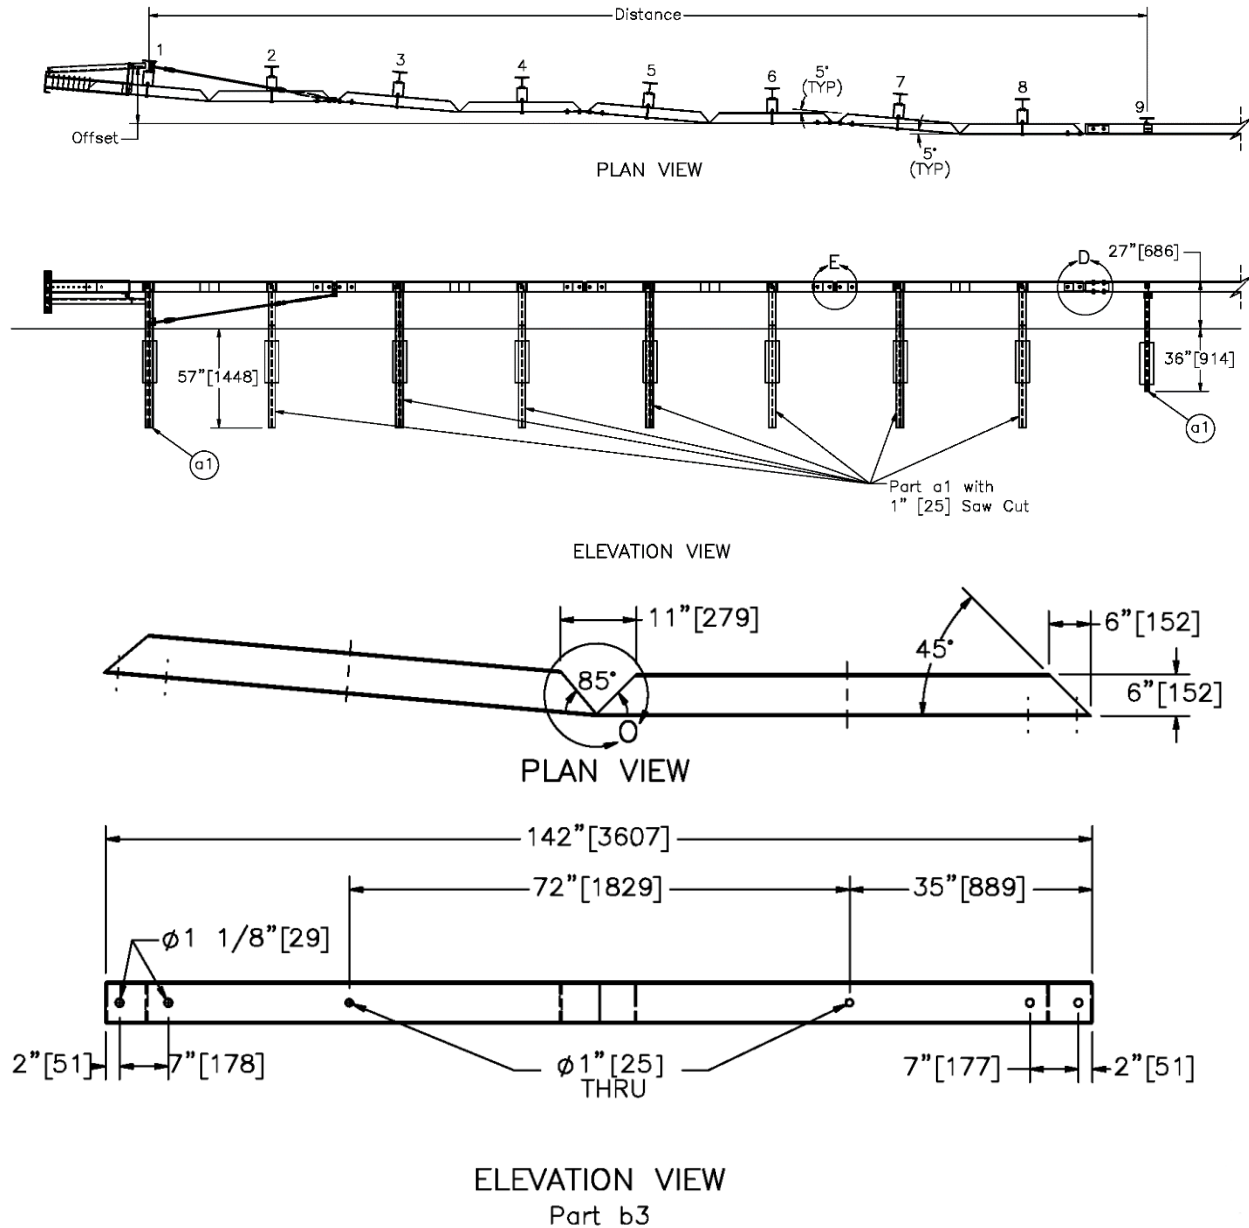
Plan and Elevation Views of Box Beam, Test No. NYT-1
